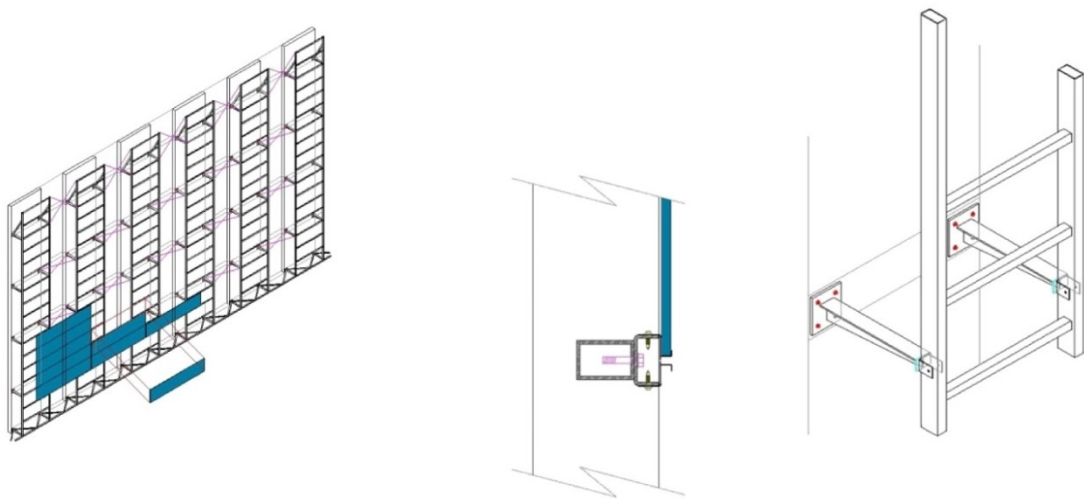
Construction method of the Ventilated Façade (Product Manual, OnyxSolar, 2011)
